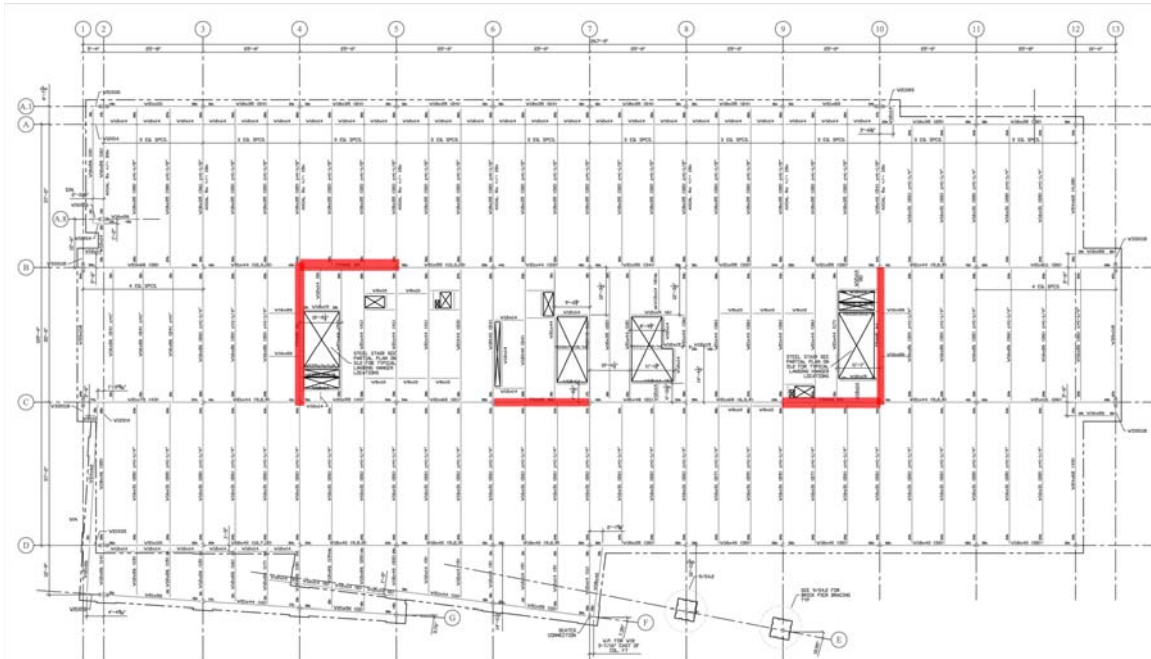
3<sup>rd</sup> Floor plan with highlighted frames
